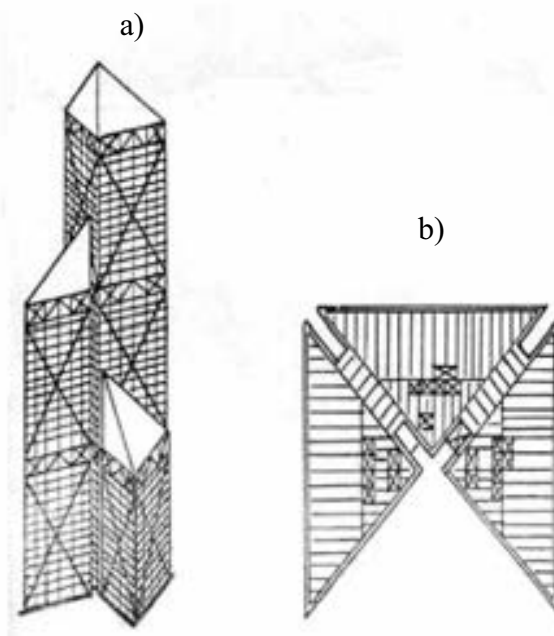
Constructional scheme of the frame “Torre Bakaven” in Karakas: a) general sight, b) plan.
